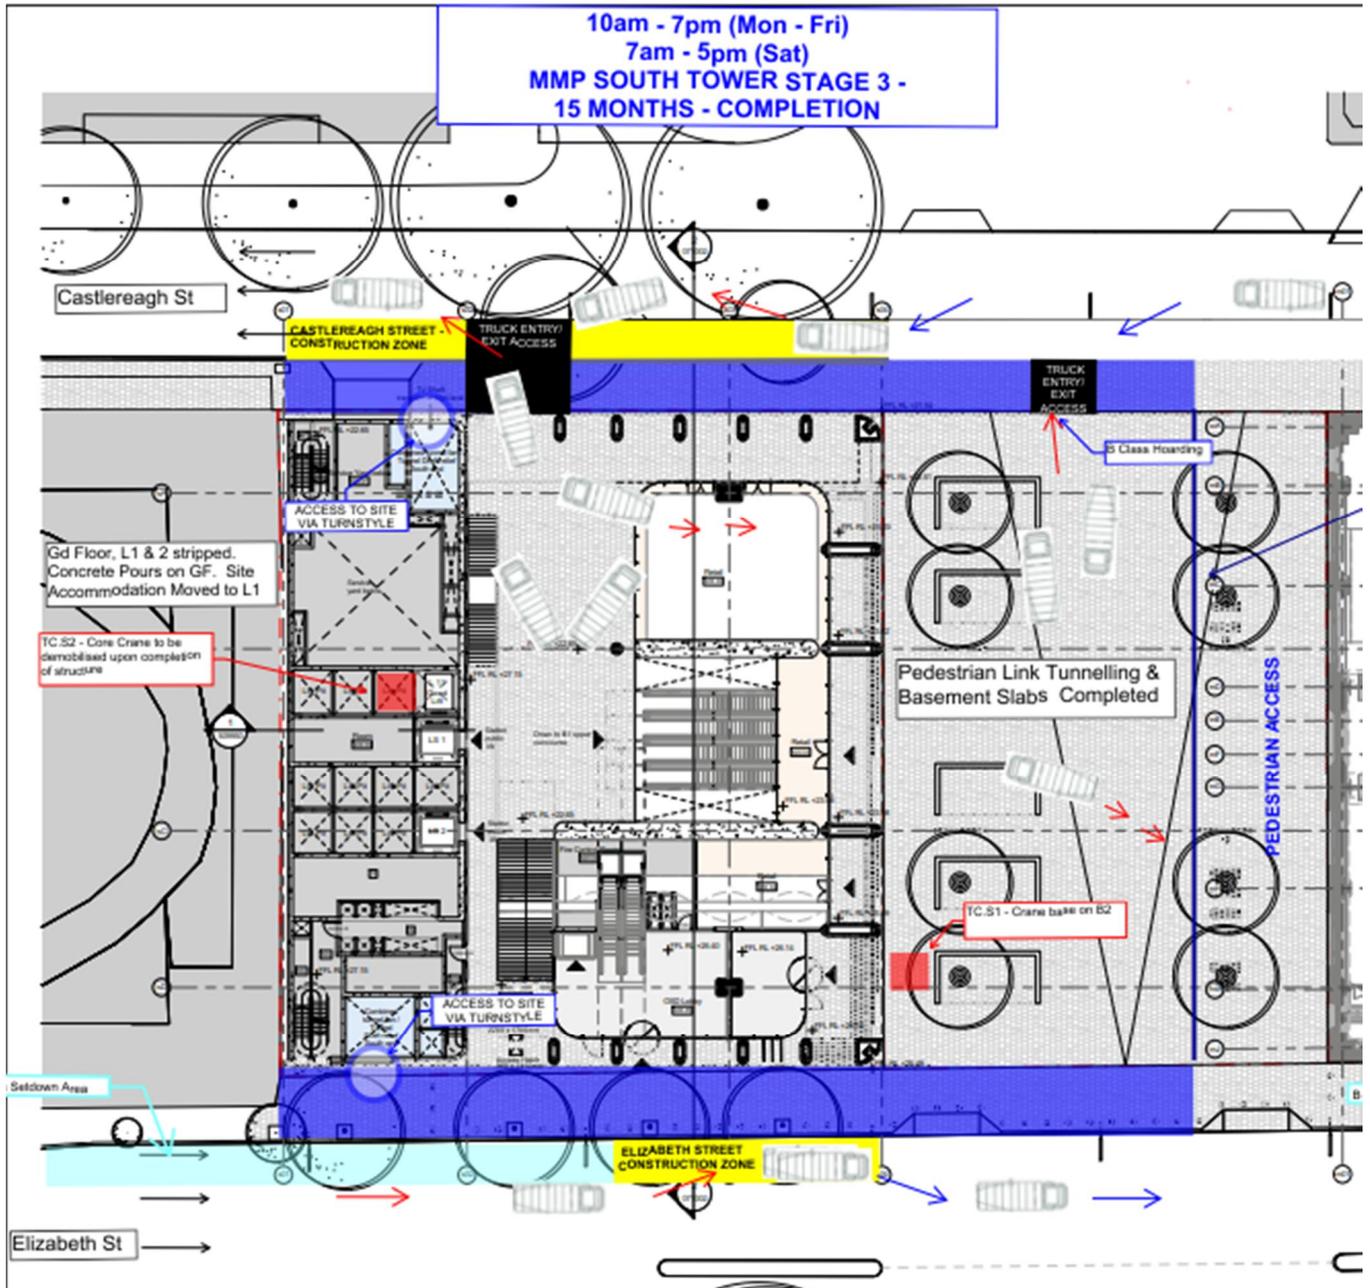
Construction Zoning Stage 3 - 7am - 7pm
